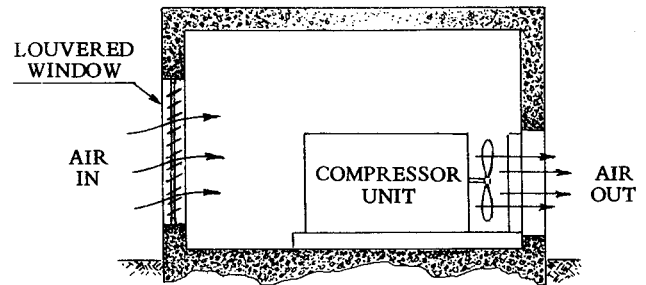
COMPRESSOR ENCLOSURE
